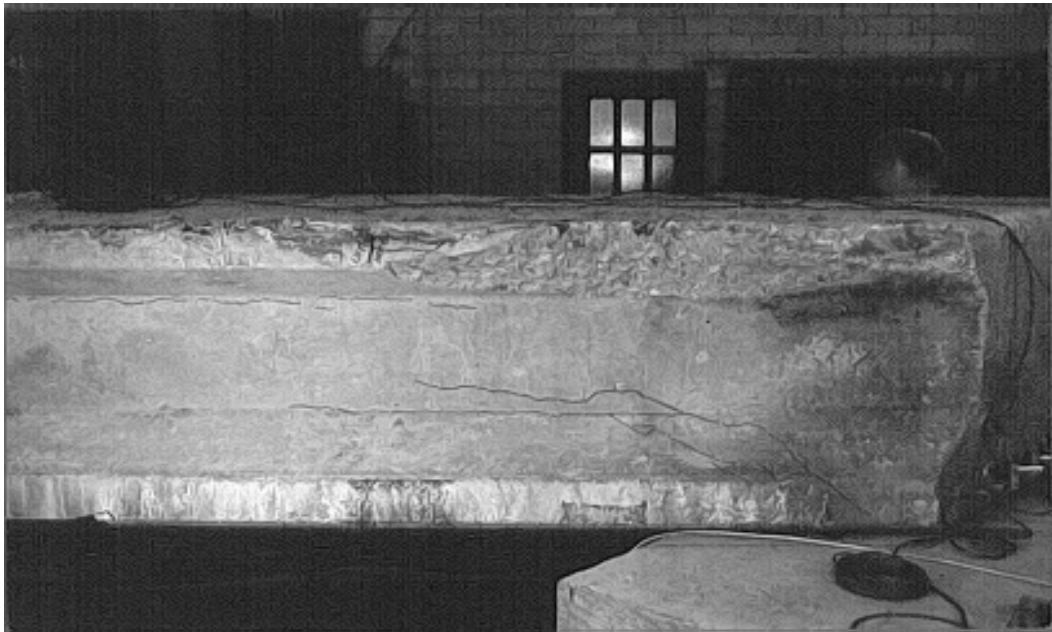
Pretest Cracking of West Face of Box Beam 5 - Test 2
